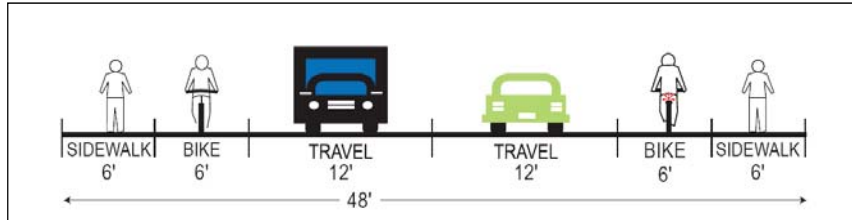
Avenue S Cross Section US 101 to Bridge
